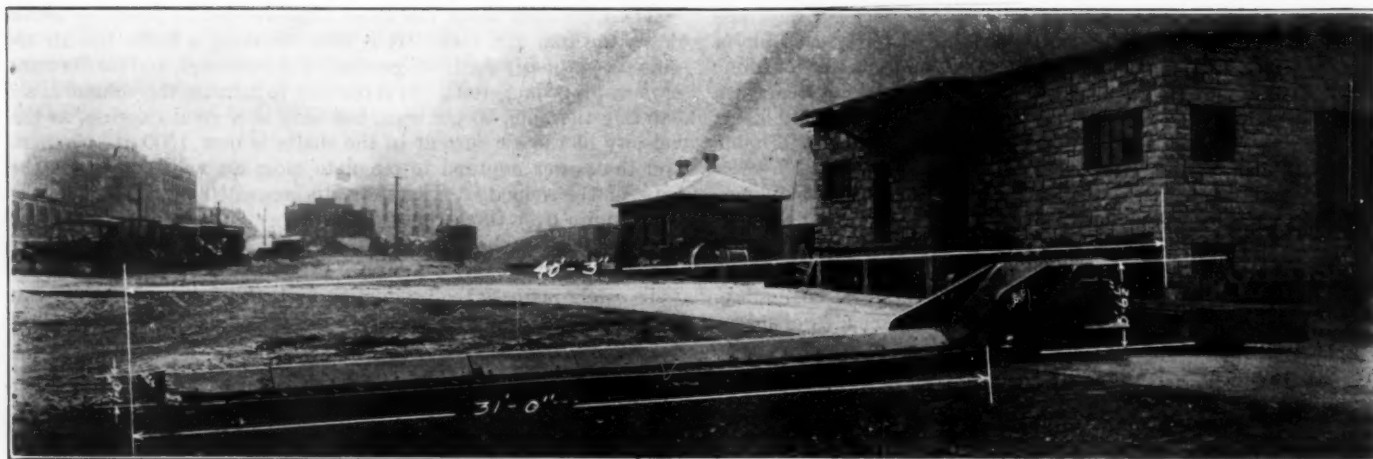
FRONT VIEW OF NO. 3 MACHINE
